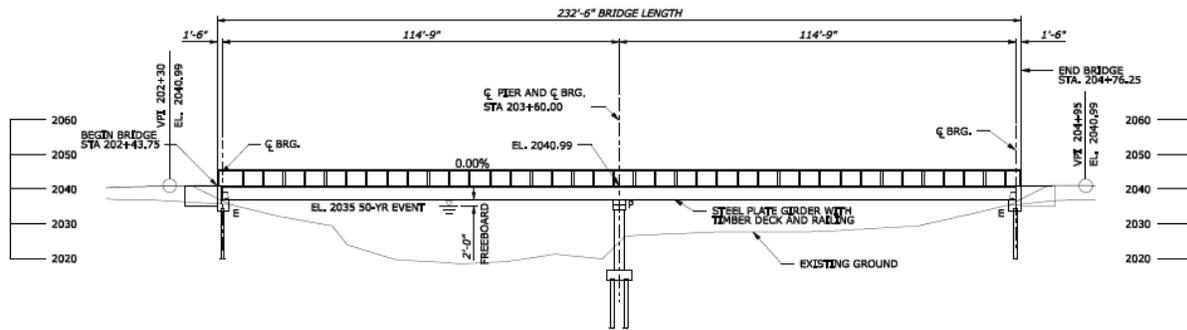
BRIDGE PIERS WITHIN PAWNEE RIVER CHANNEL
